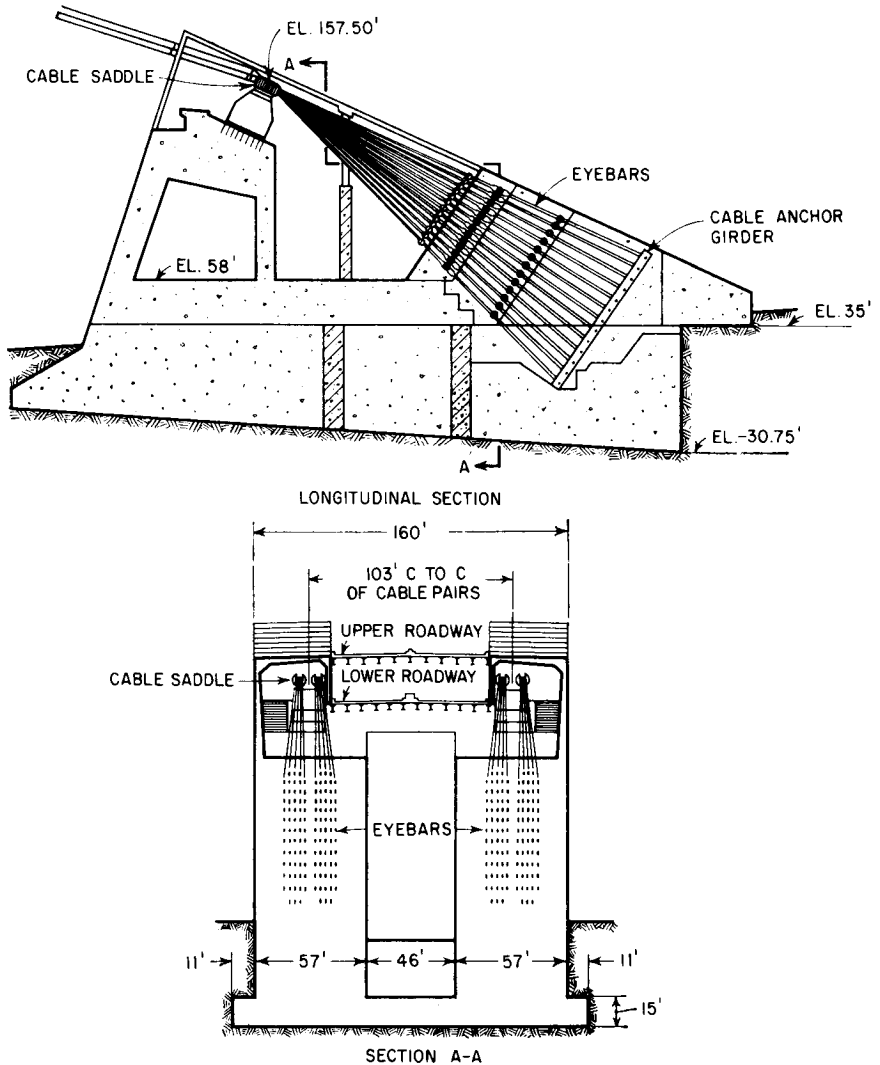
Anchorage for Verrazano Narrows Bridge.
